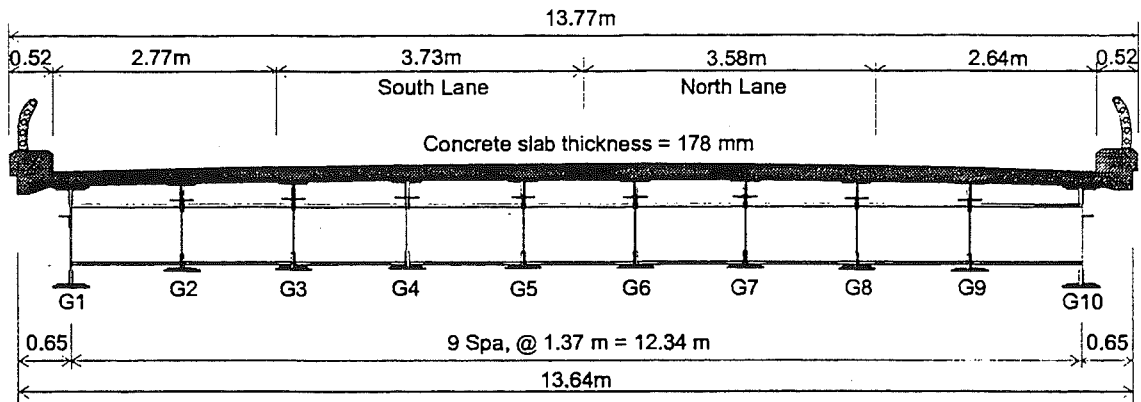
Cross-Section of Bridge M82/TC (B01-59041).
